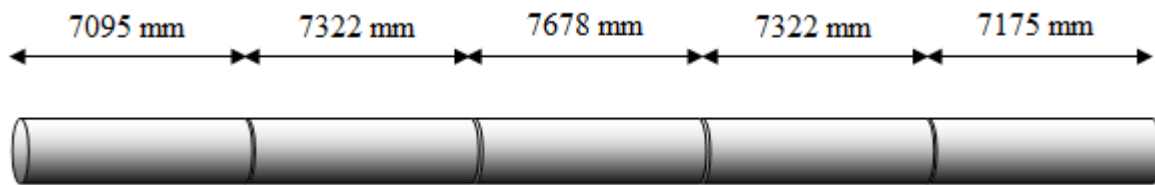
Schematic assembly of pipe segments for specimen of Test No. 8.
